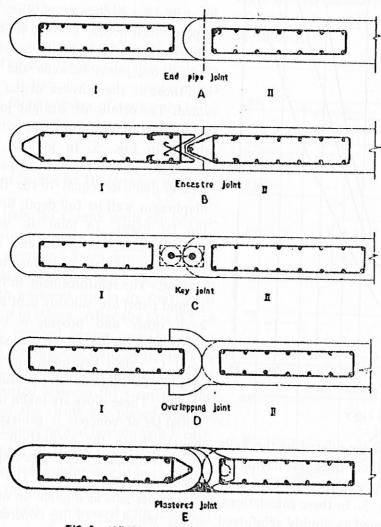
JOINTS BETWEEN STRAIGHT PANELS.
